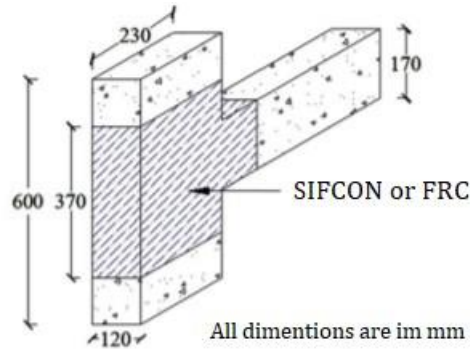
Beam-column reinforced joint with SIFCON or FRC strengthen
